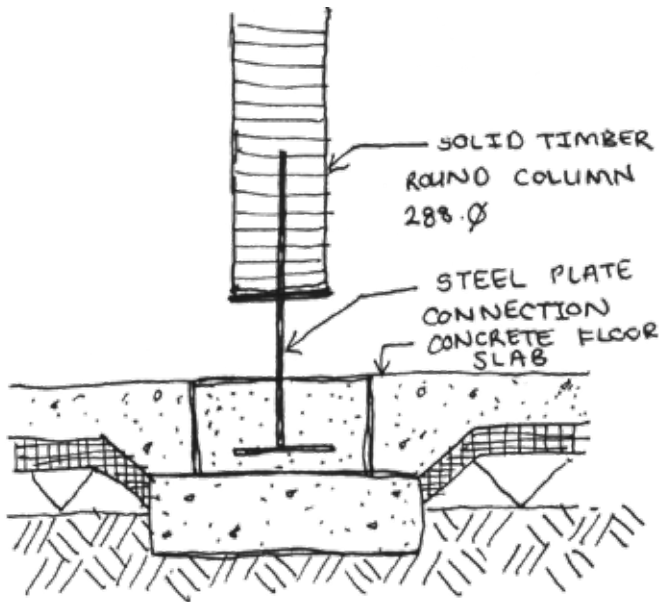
Timber Construction: Foundation (Caldeira, 2019: drawing).
